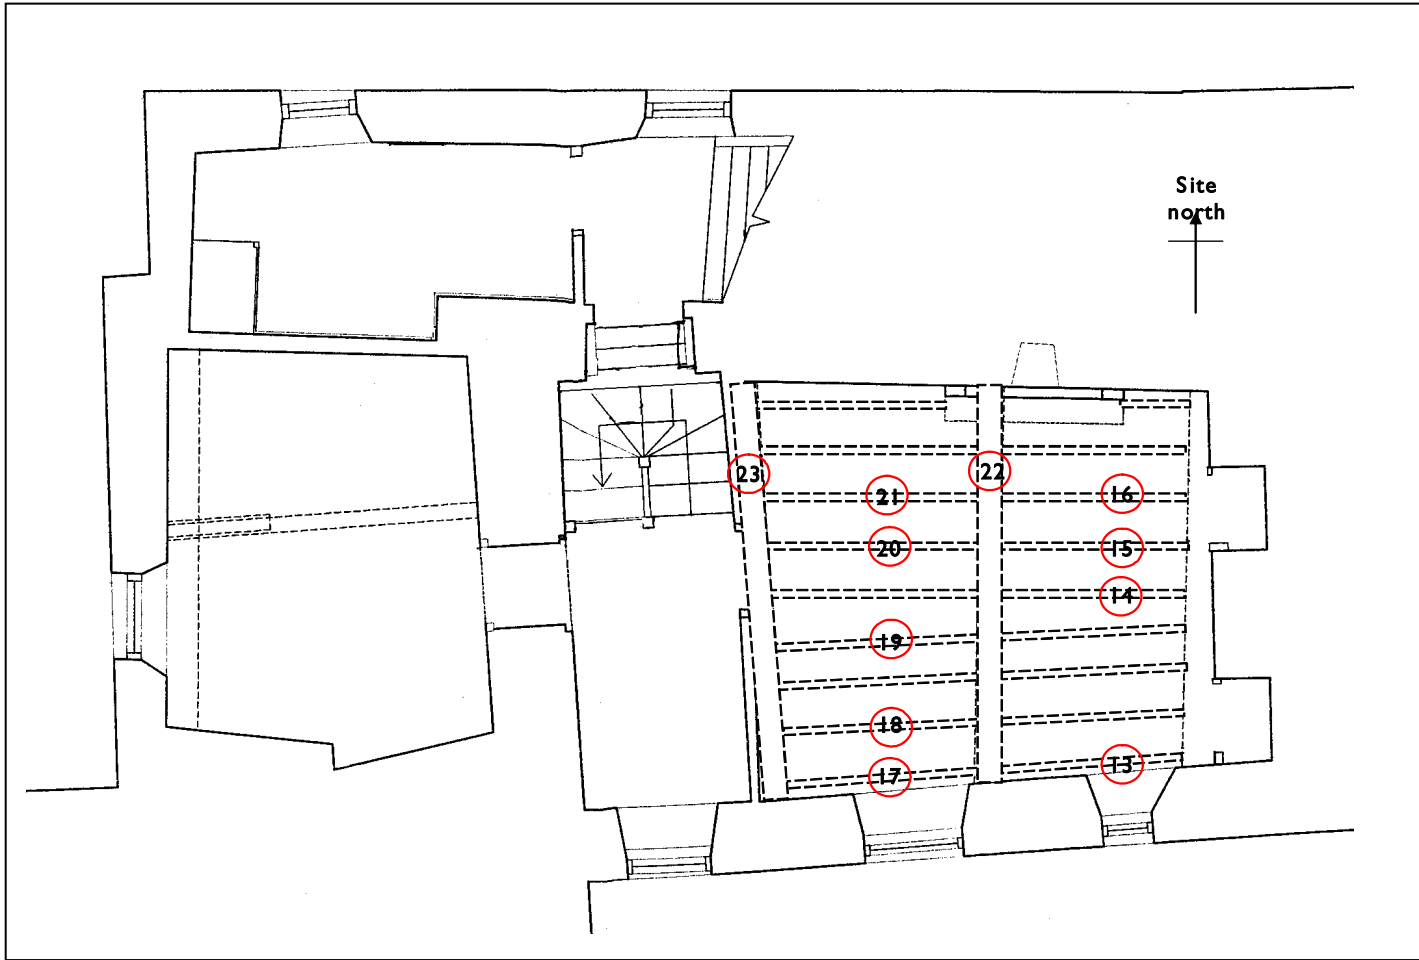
Ceiling to bedroom 1 (first floor No 1 The Square) to show sampled timbers (after Peter Ryder)
